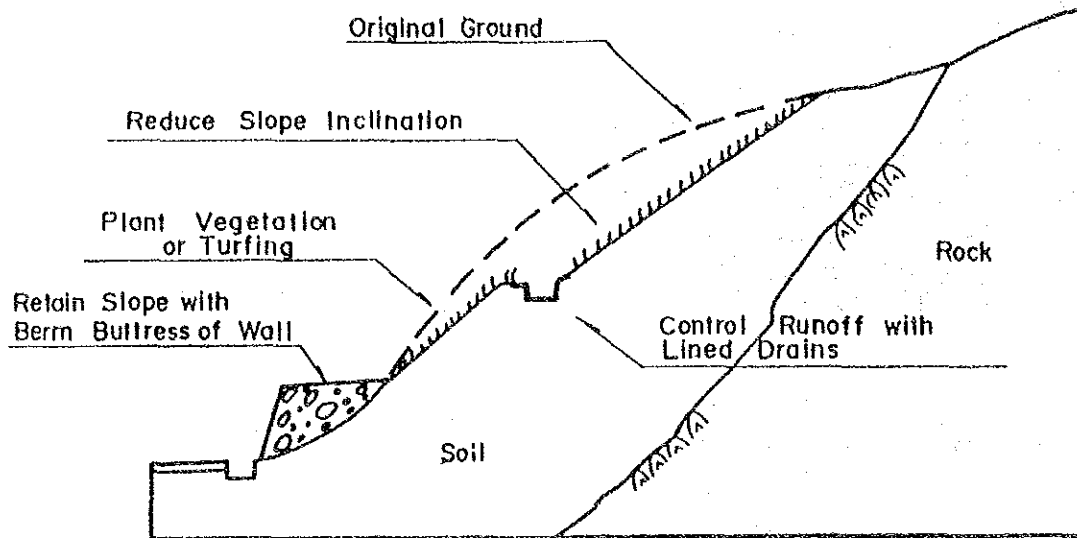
General Methods of Slope Stabilization No.2
